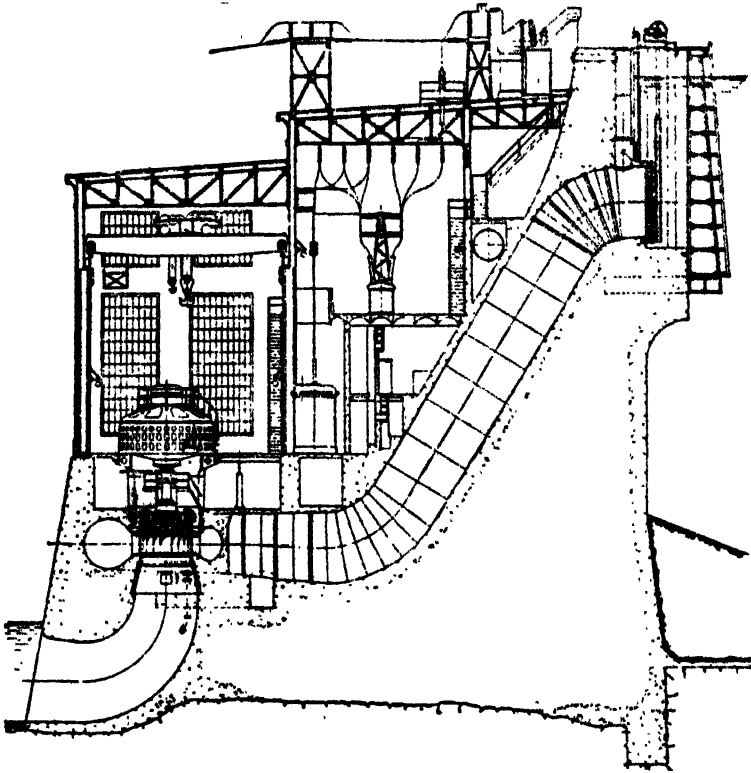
Section through Medium-Head Plant Using Penstock and Scroll-Cased Turbine
